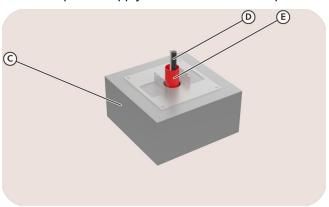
Example of a solid foundation (C), with cables (D) in a flexible conduit system (E)
